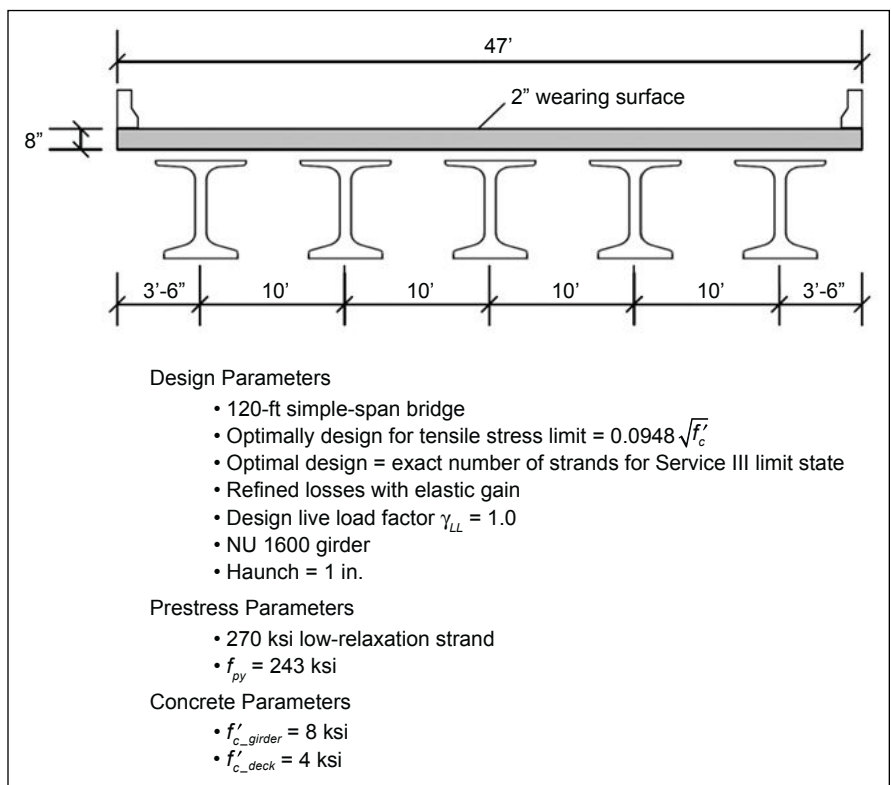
Example prestressed concrete bridge. All Figures: University of Nebraska–Lincoln.
